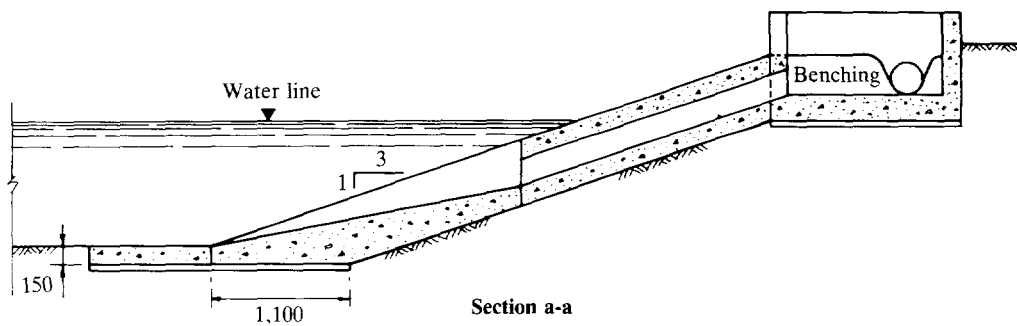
Inlet Structures for Stabilization Ponds
